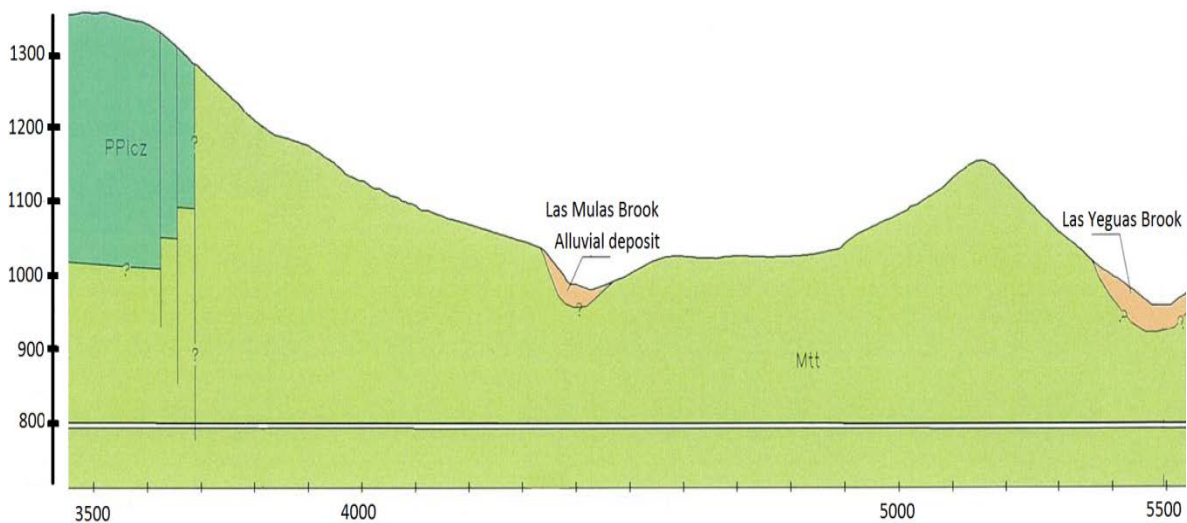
Castillo tunnel longitudinal profile. Chainage 3700 – 5500.
